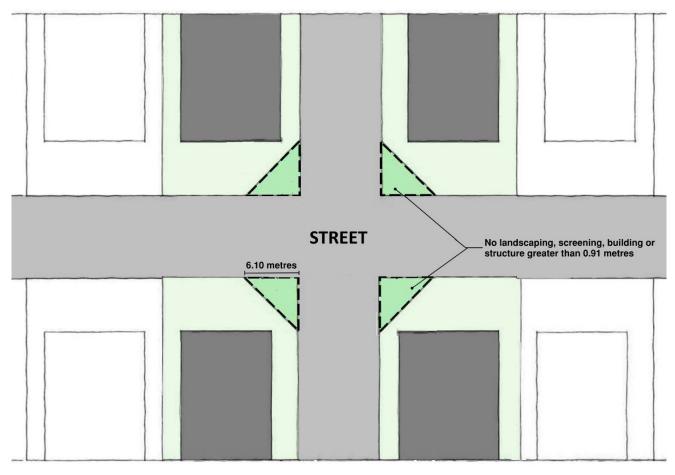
Visibility at Intersections, Area that landscaping, screening, building, or structures are prohibited over 0.91 metres in height
